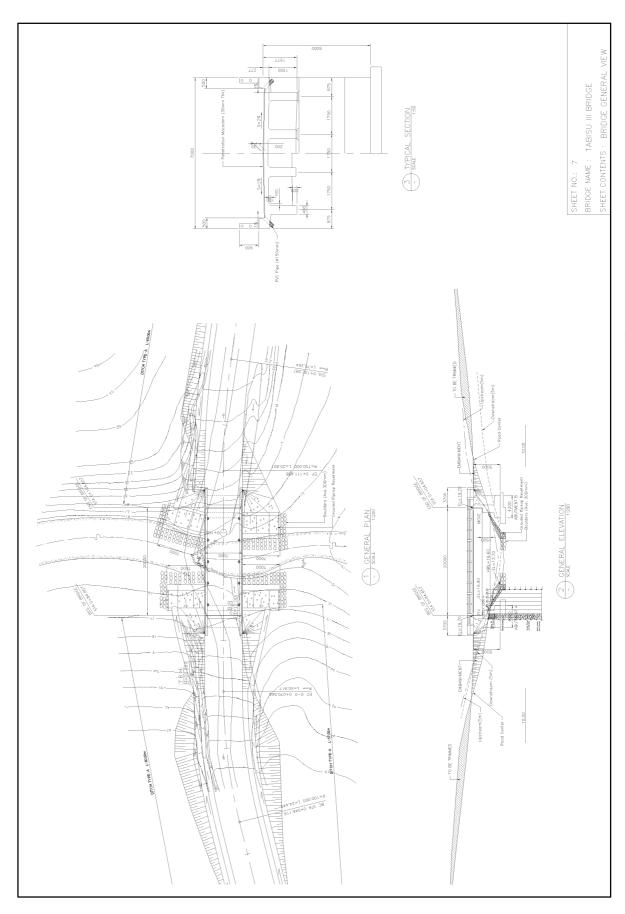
Bridge General View of TabisuII Bridge
